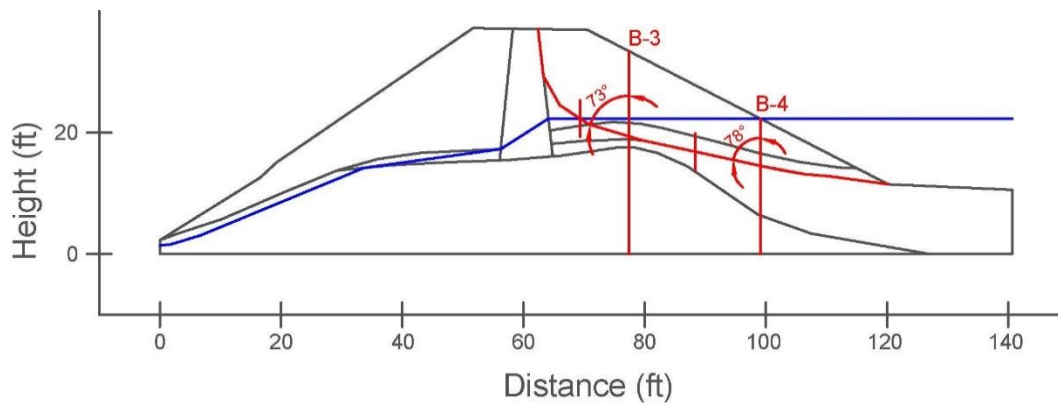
Sub-sectioning of the cross-section and failure plane for La Palma Dam
